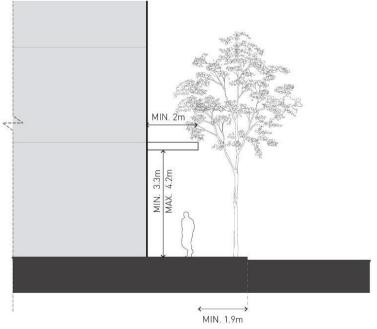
Typical Awning Condition with Street Trees
